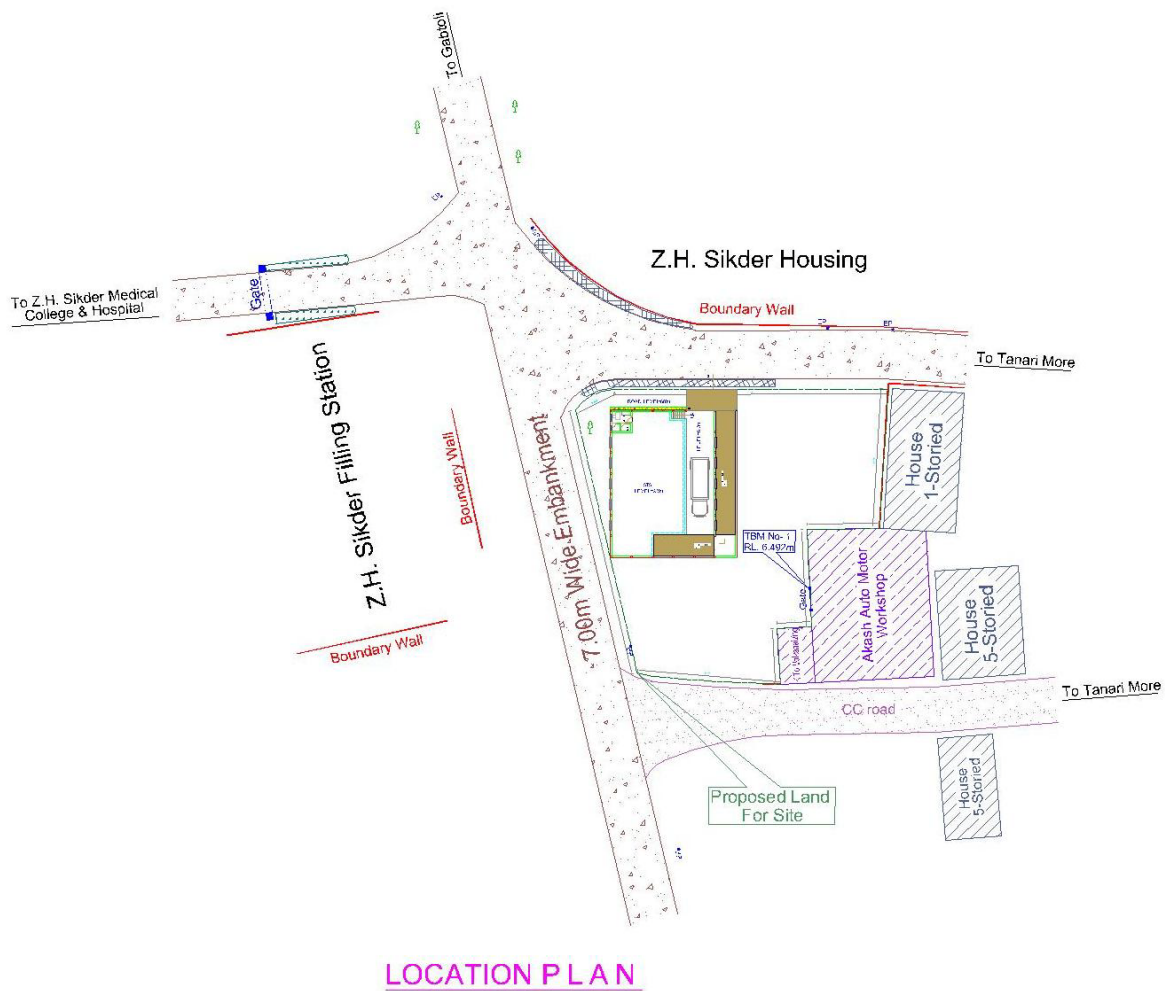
STS – 6 Berry Bandh Rayer Bazar Layout Plan (23°44'25"N, 90°21'39"E)
